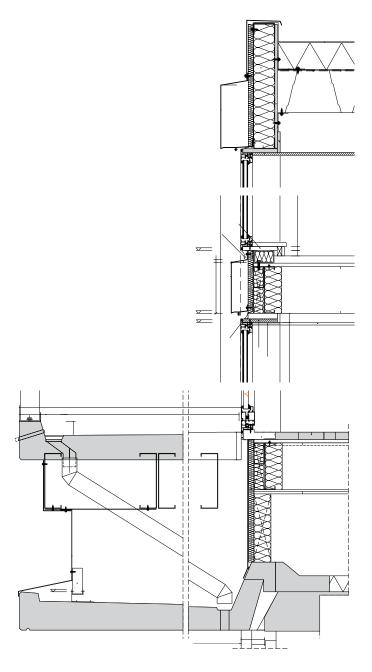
Detailed section thorugh front facade of top-up (ter Borch, 2007)
